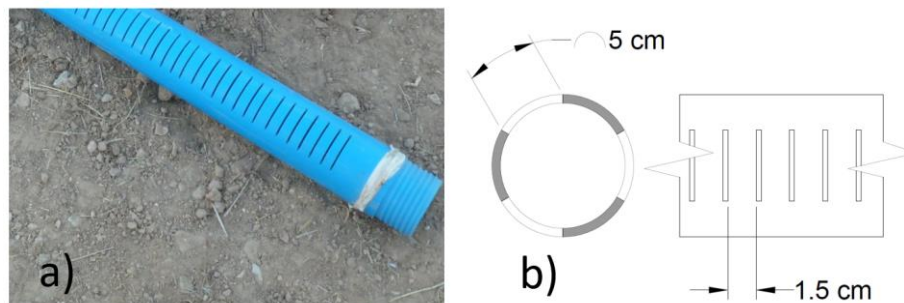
a) Underground perforated pipe; b) cross-section and elevation view of the pipe used
